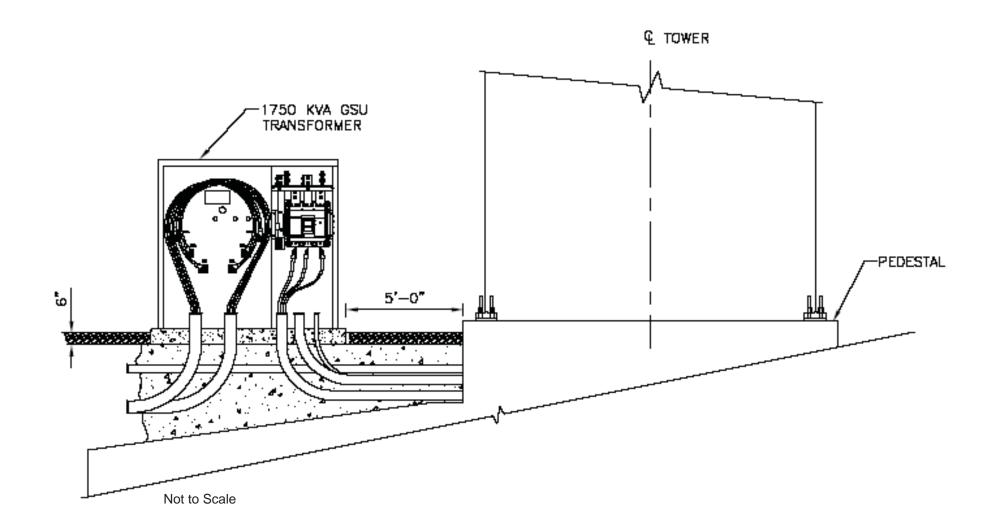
Typical Transformer Foundation MONTAGUE WIND POWER FACILITY
